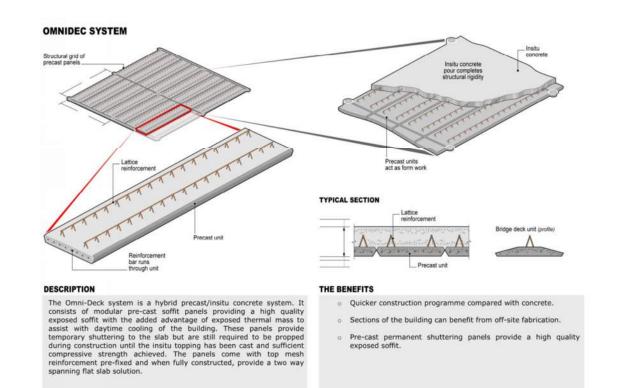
Structural Slab options -Omnia pre-cast concrete decks with structural topping (below)
